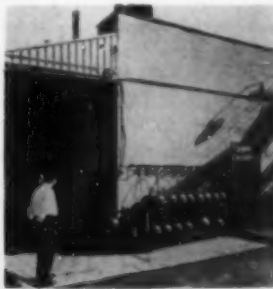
Transit panels are used in another type of explosion-proof, soft wall construction.
